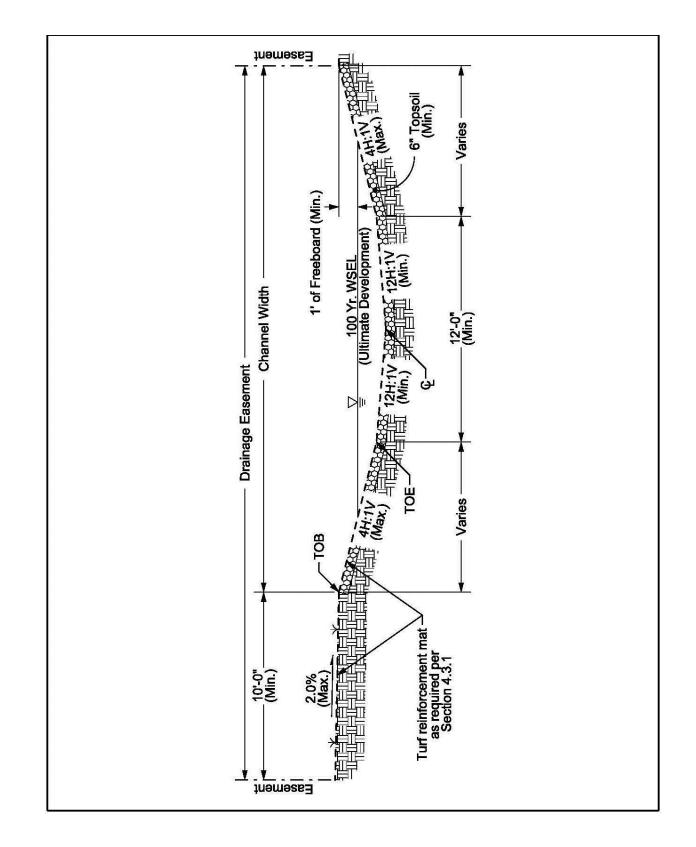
Plan – View - Trapezoidal Earthen Channel
